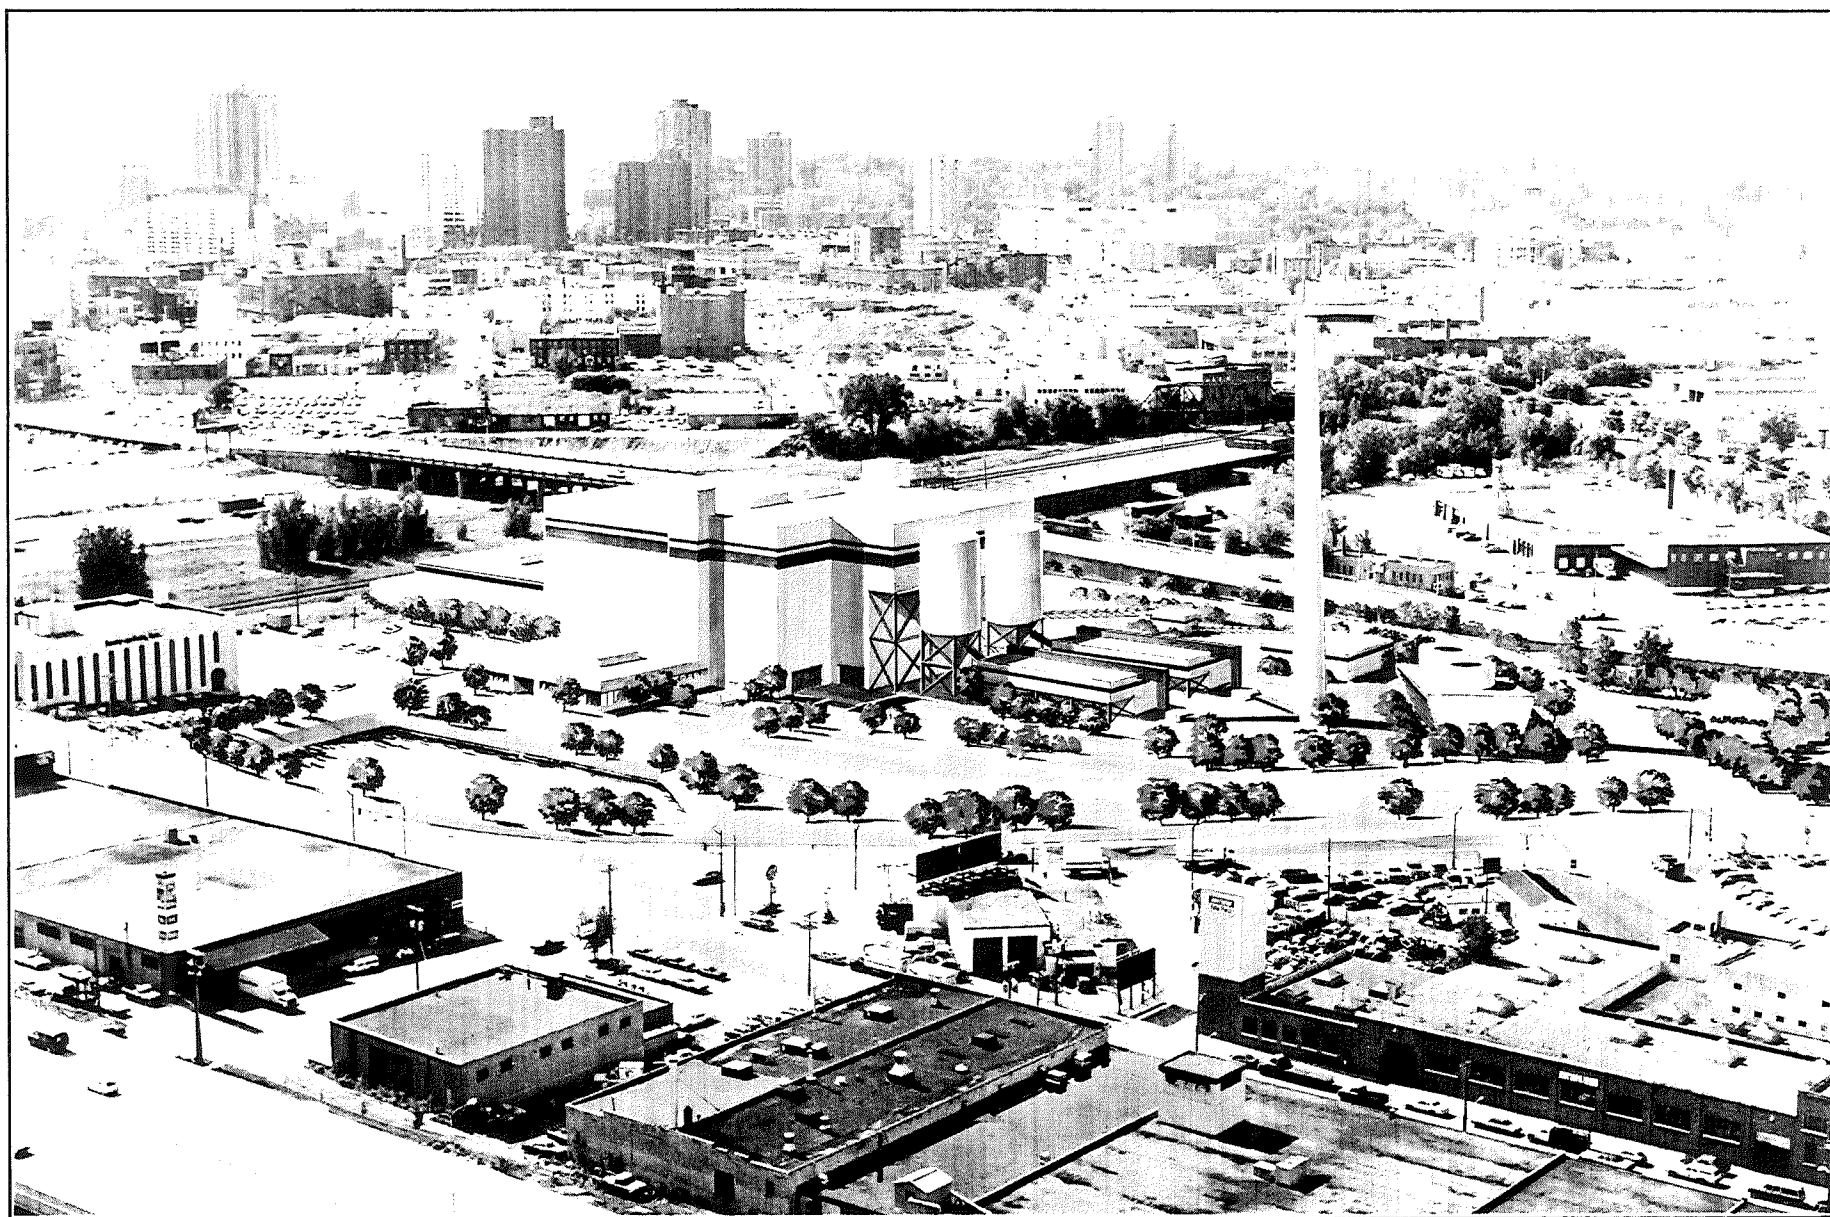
Greyhound Site Photo with Resource Recovery Facility Rendering.
